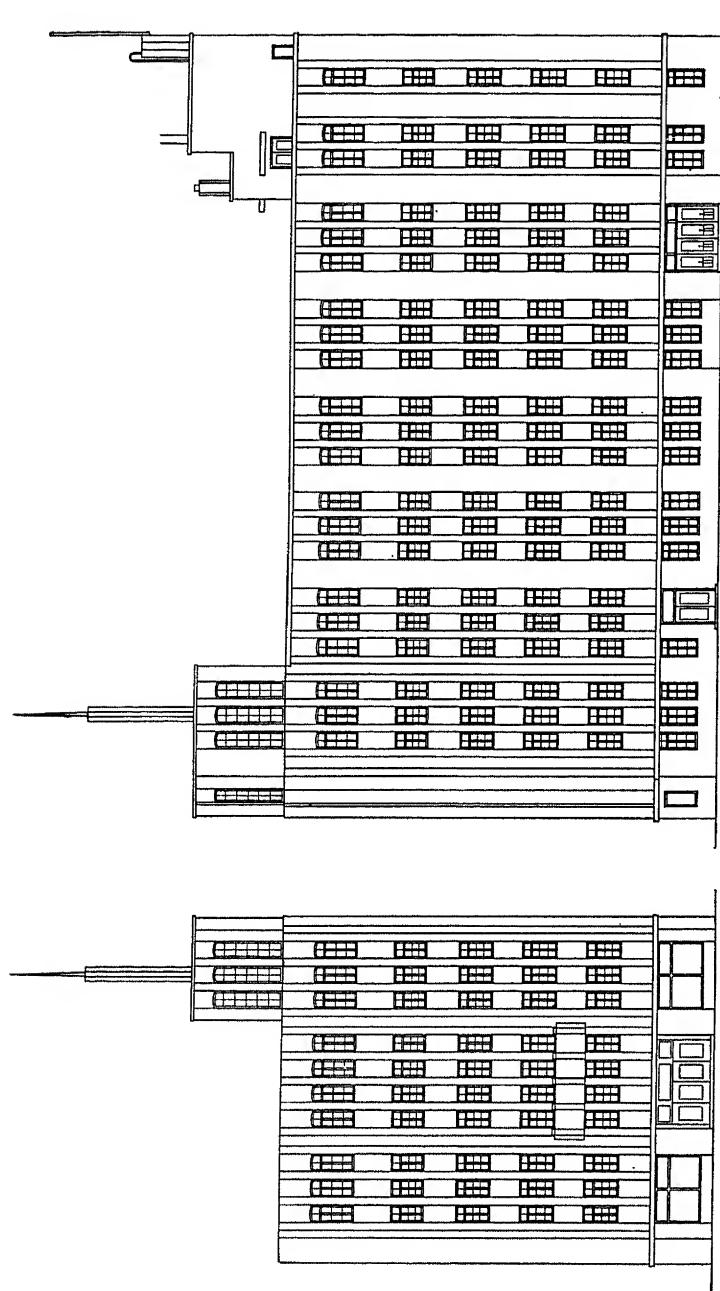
Elevations, Daiwa Department Store, Fukuji, Japan.
